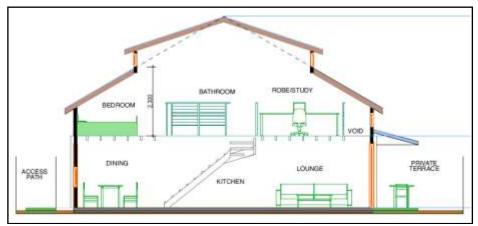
Proposed typical Section showing roof windows for upper floor level
